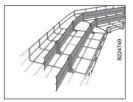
is used for mounting of Separating Plate B36 onto Mesh tray.
